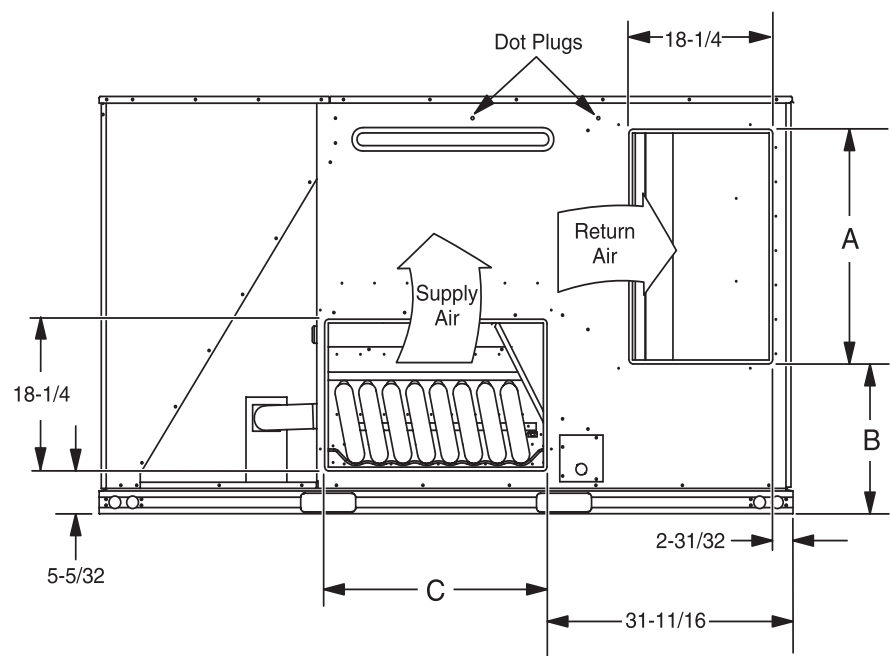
DR090, 120 REAR DUCT DIMENSIONS
